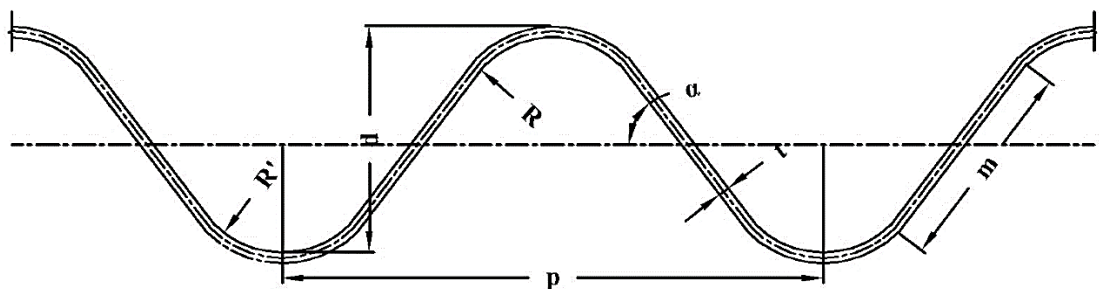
Section of arc-and tangent-type corrugated sheets.^[5]
